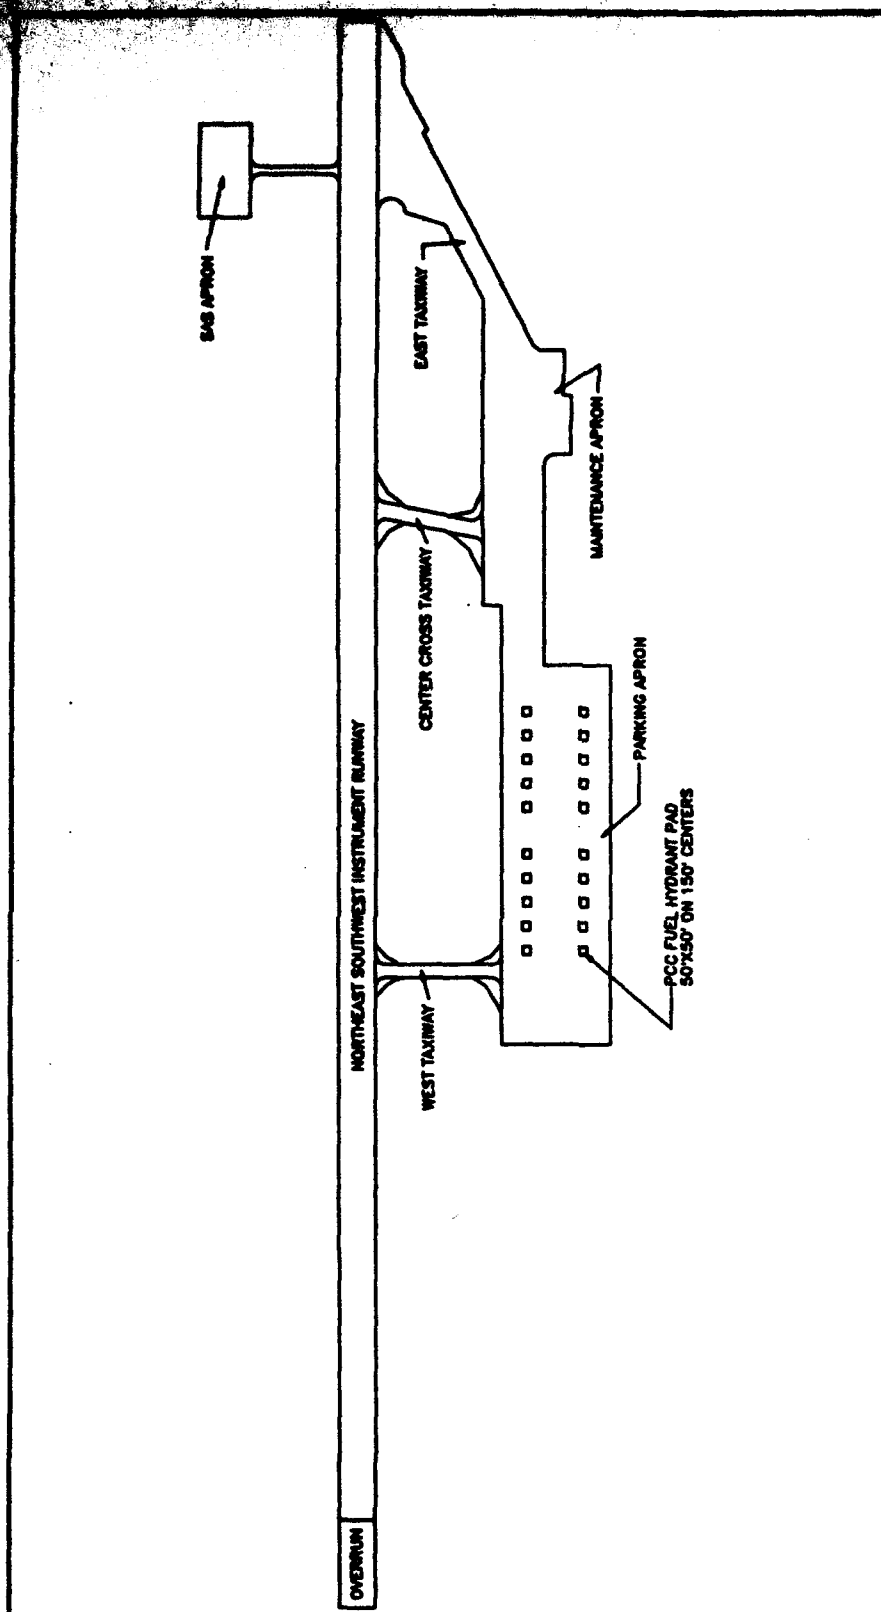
Layout of airfield pavements at Sondrestrom Air Base
